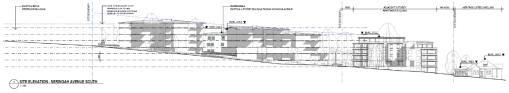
Site Elevation – Neringah Avenue South. (Source: Bickerton Masters Architecture)
